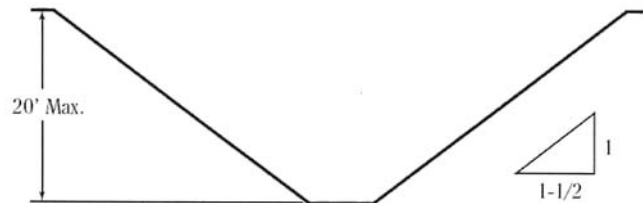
EXCAVATIONS MADE IN TYPE C SOIL
